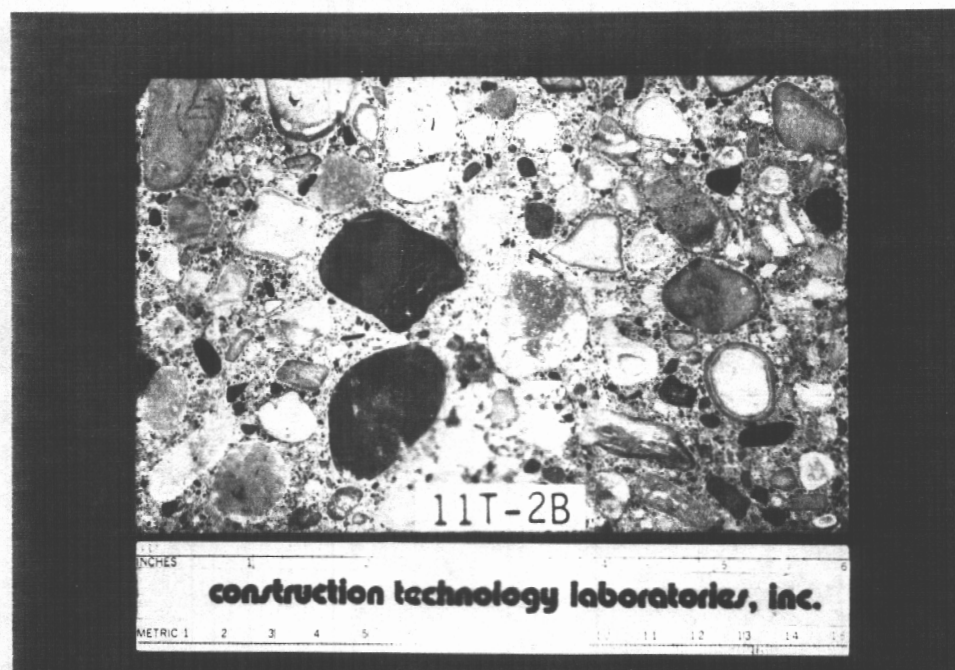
LAPPED SLICE SIDE OF CONCRETE SPECIMEN NO. 11T-2B.
